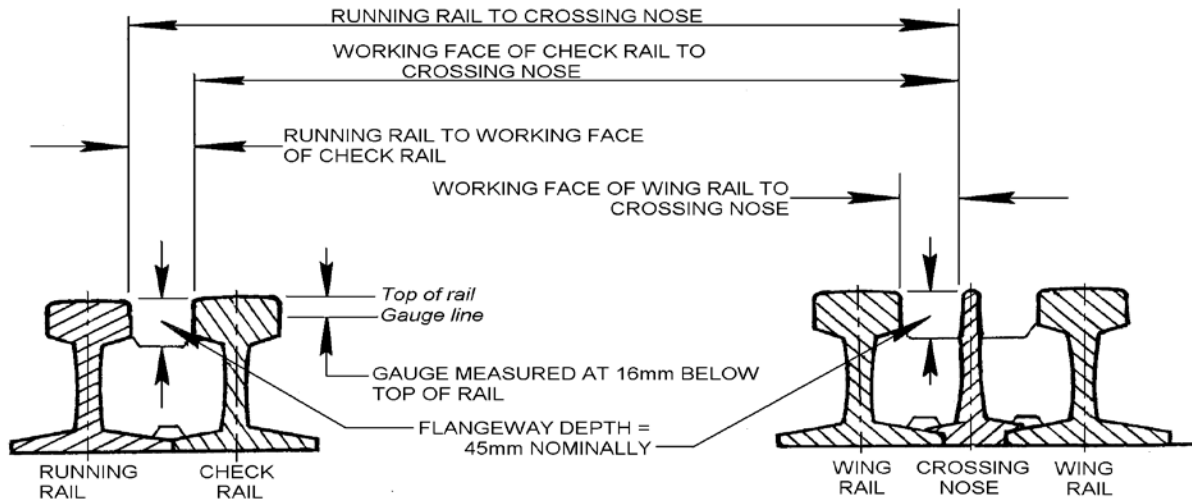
Typical part section through "V" and "K" crossings (shown for fabricated type)
